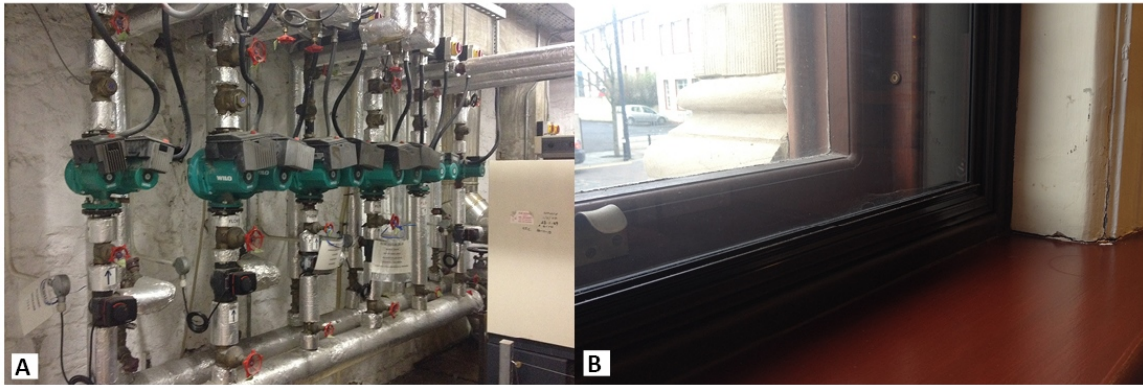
Sligo Town hall survey details showing (a) zoned and insulated heating pipes, and (b) additional glazing layer
